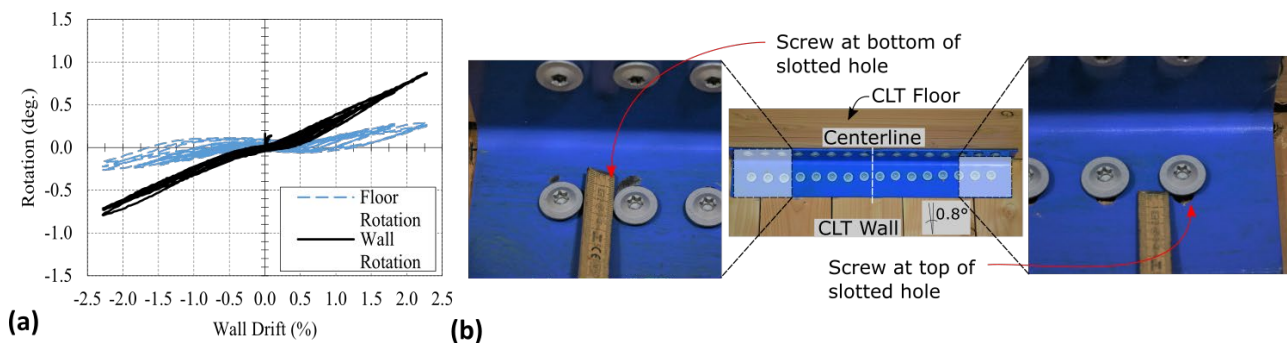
Diaphragm connection performance: (a) wall and floor rotation versus wall drift, (b) during testing photo at 1.8% wall drift ratio
